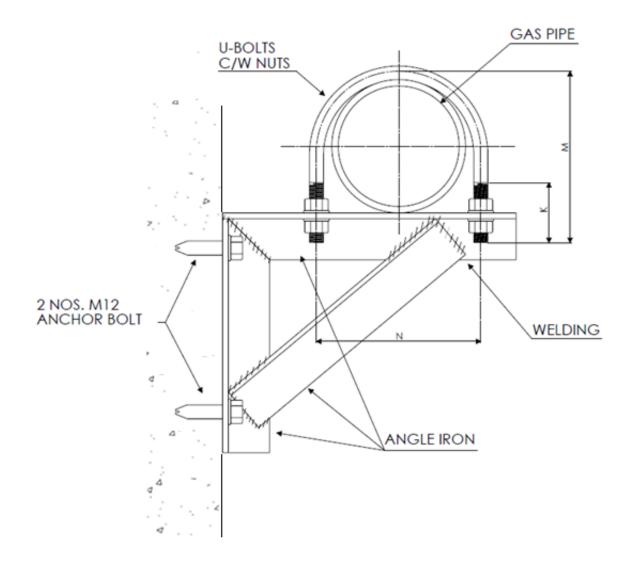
Typical Pipe Support for Horizontal Gas Pipe (H)
